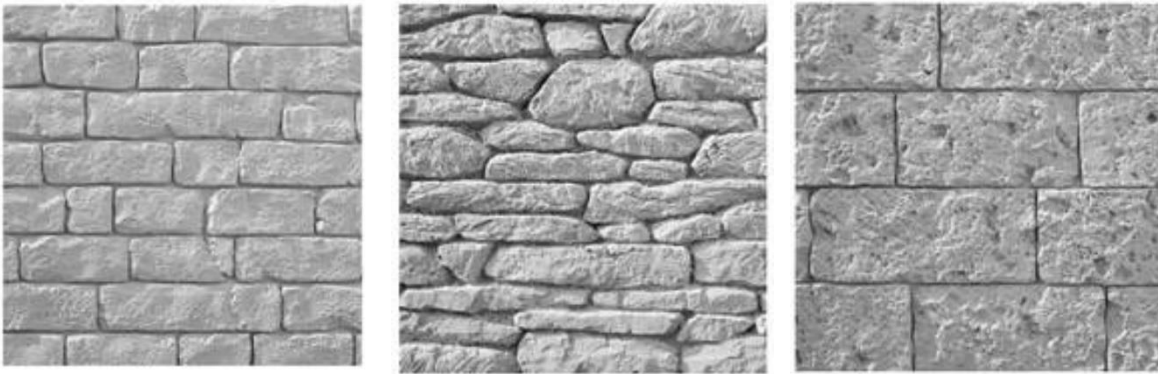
Parapets and/or H4A containment wall finishes for precast concrete
